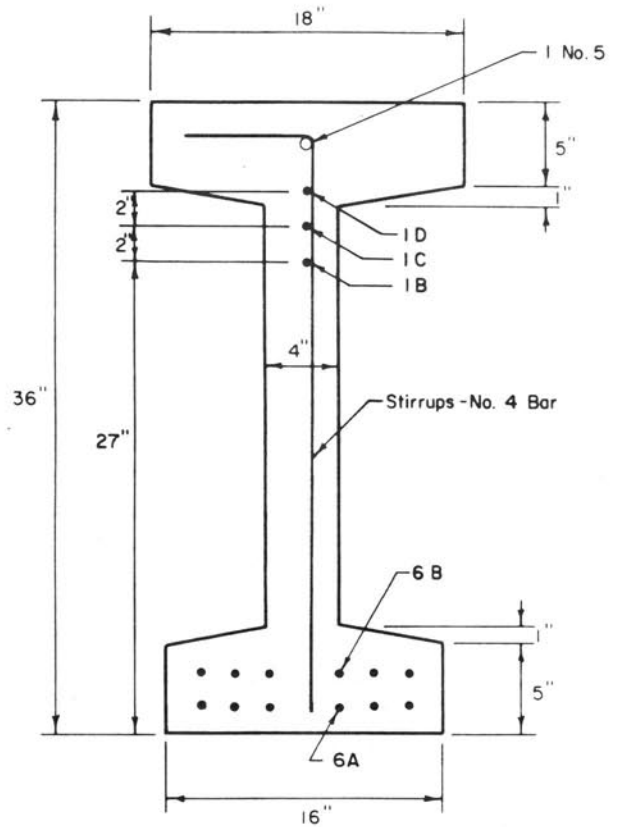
END SECTION OF THE BEAM WITH COMPRESSION REINFORCEMENT
